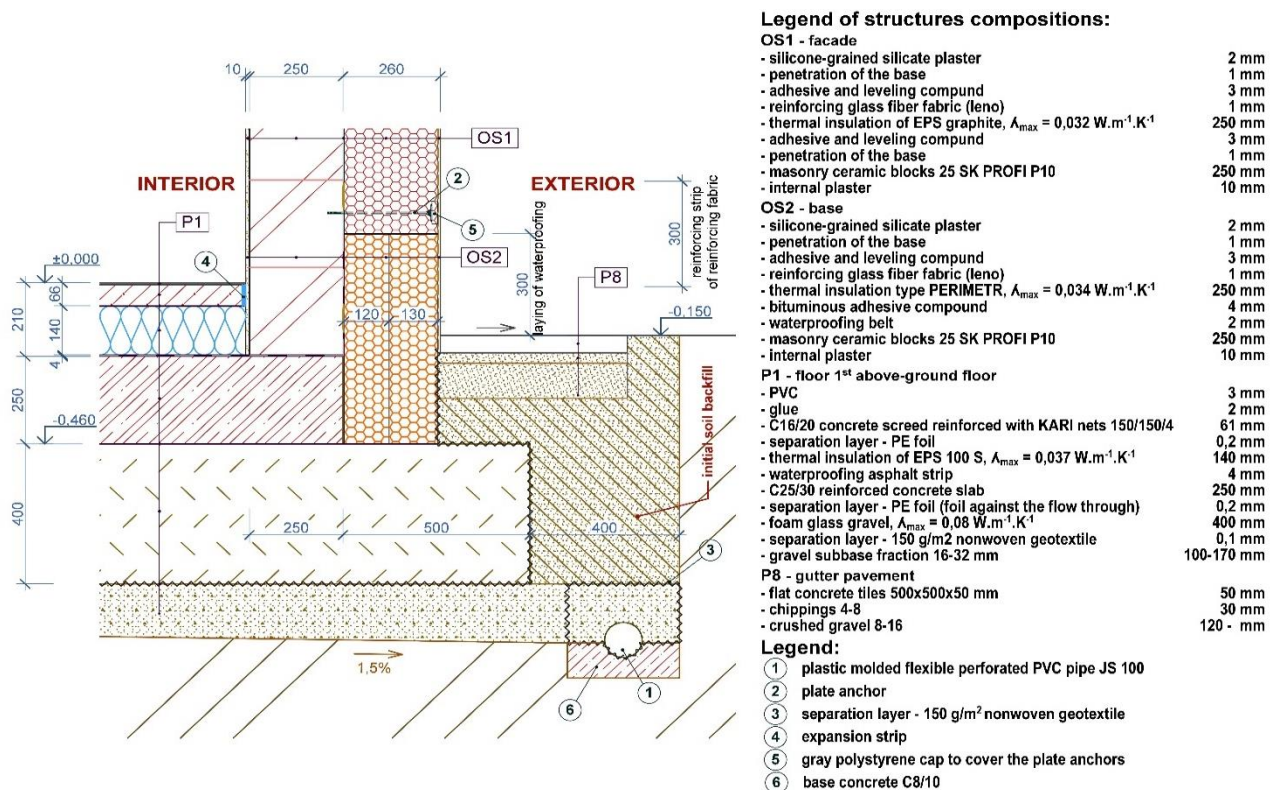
Detail of the method of founding a family house on the foundation slab.
